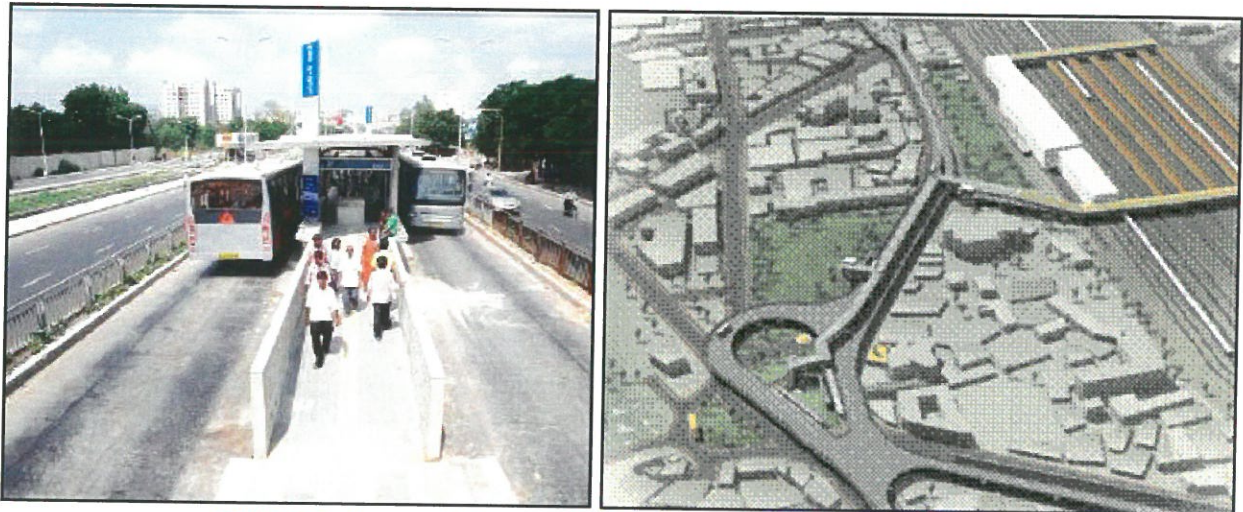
Ramp and Access to Bus Station and Elevated BRT at Kalupur
